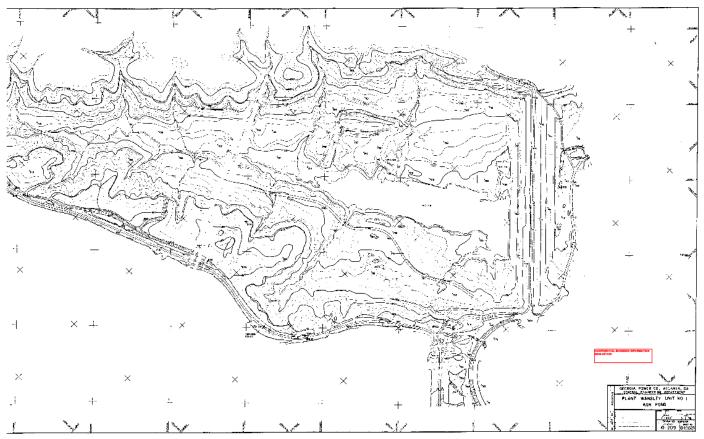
a: Plant Wansley Unit No 1 – Ash Pond
